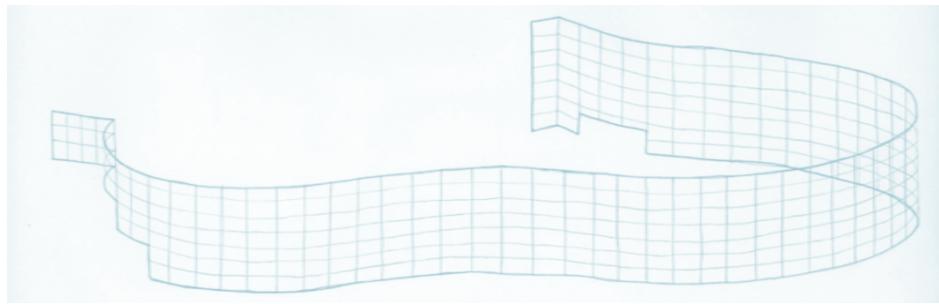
Sketch of the Vertically Plumb Curtain Wall
